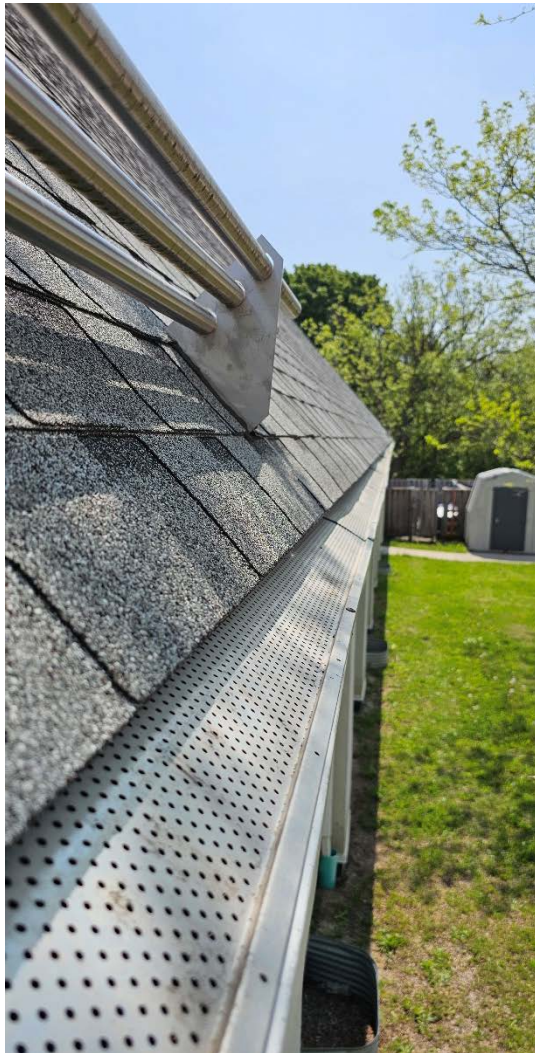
View of asphalt shingle roof, eavestrough with leaf guards. Image: +VG Architects
